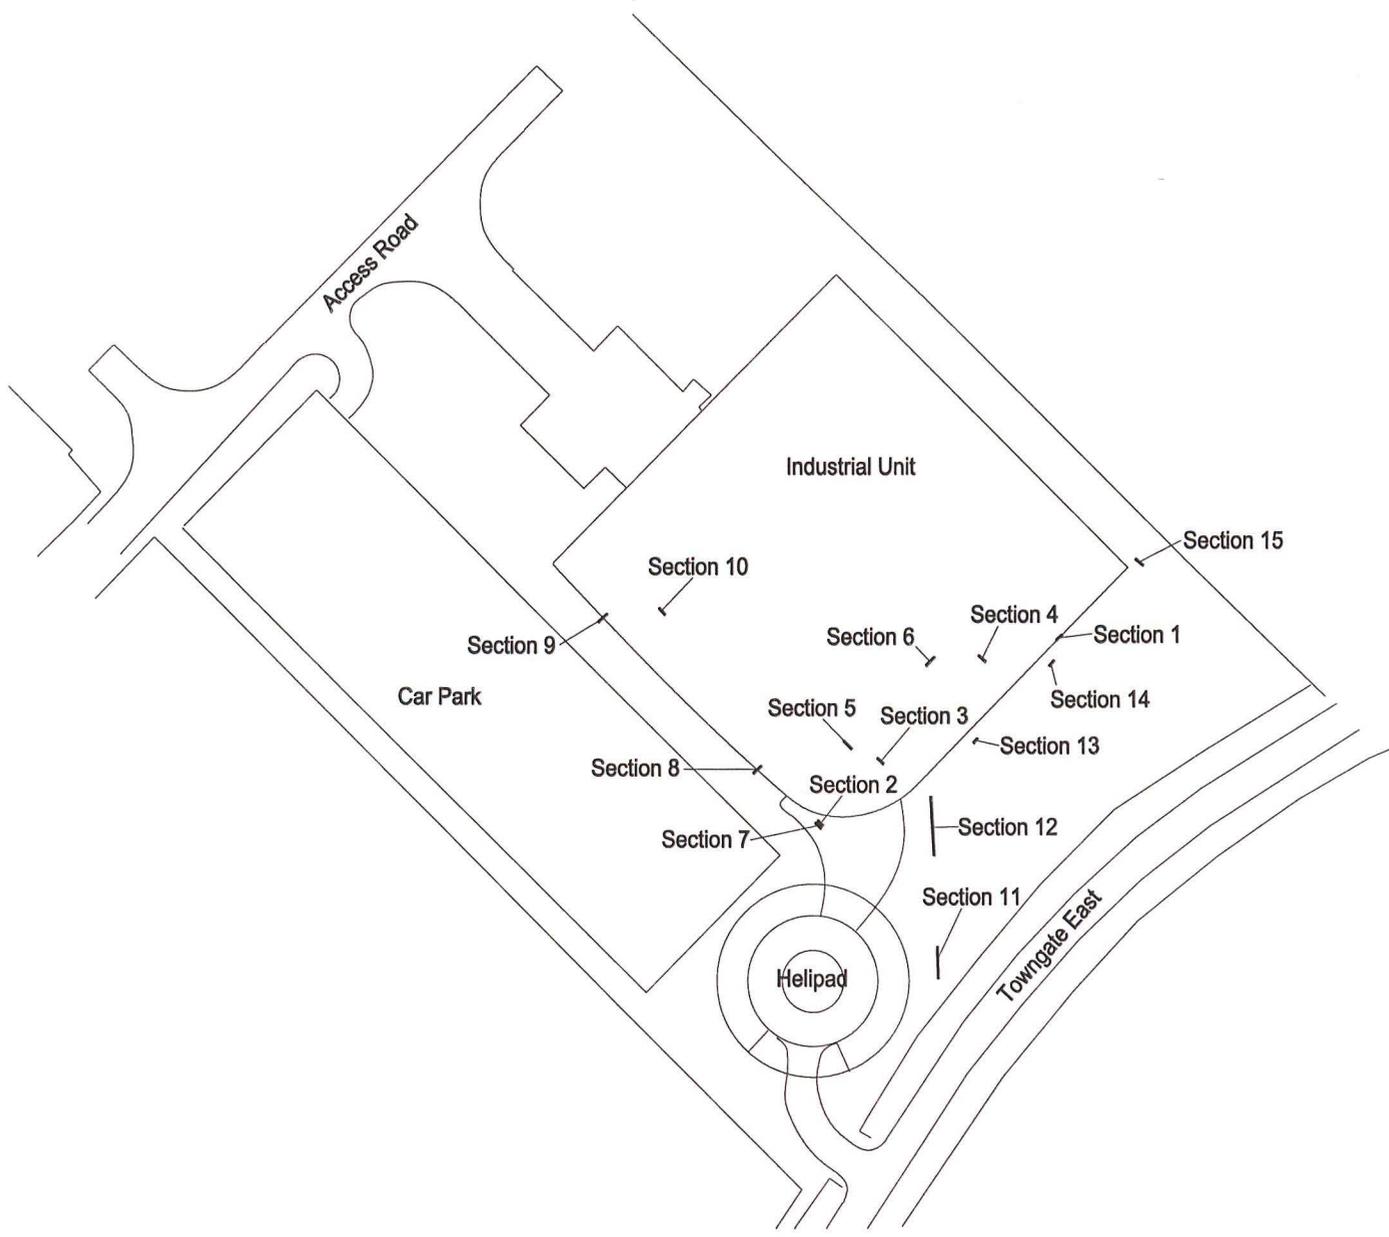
Plan of the Development Area Showing Section Locations. Scale 1:1250.
